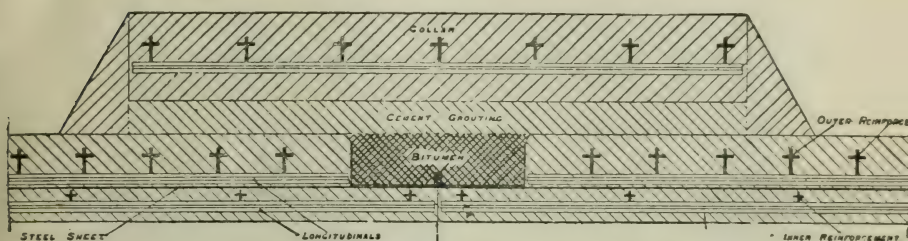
"Bonna" Pipe : Section through Pipe and Collar.
